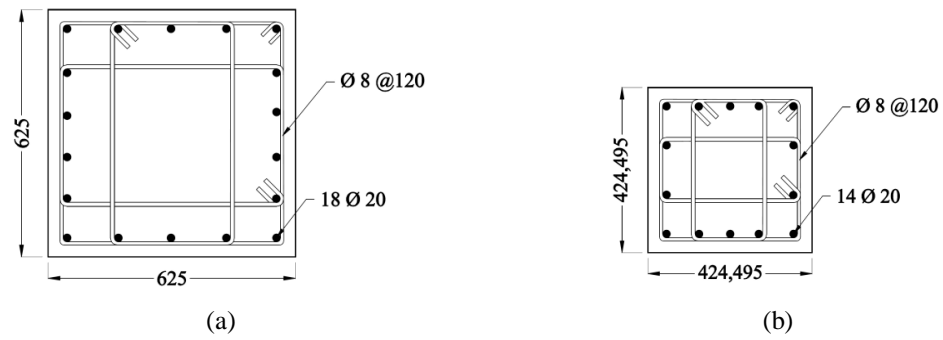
Columns cross-section details of the Modified 5 case of structure with eccentricity ratio equal to 0.205 (a) C1 and (b) C2, C3, C4 (all dimensions are in millimetres).
